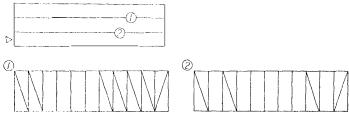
Tension of a bracing in the roof beam (central part of the roof m/m).
